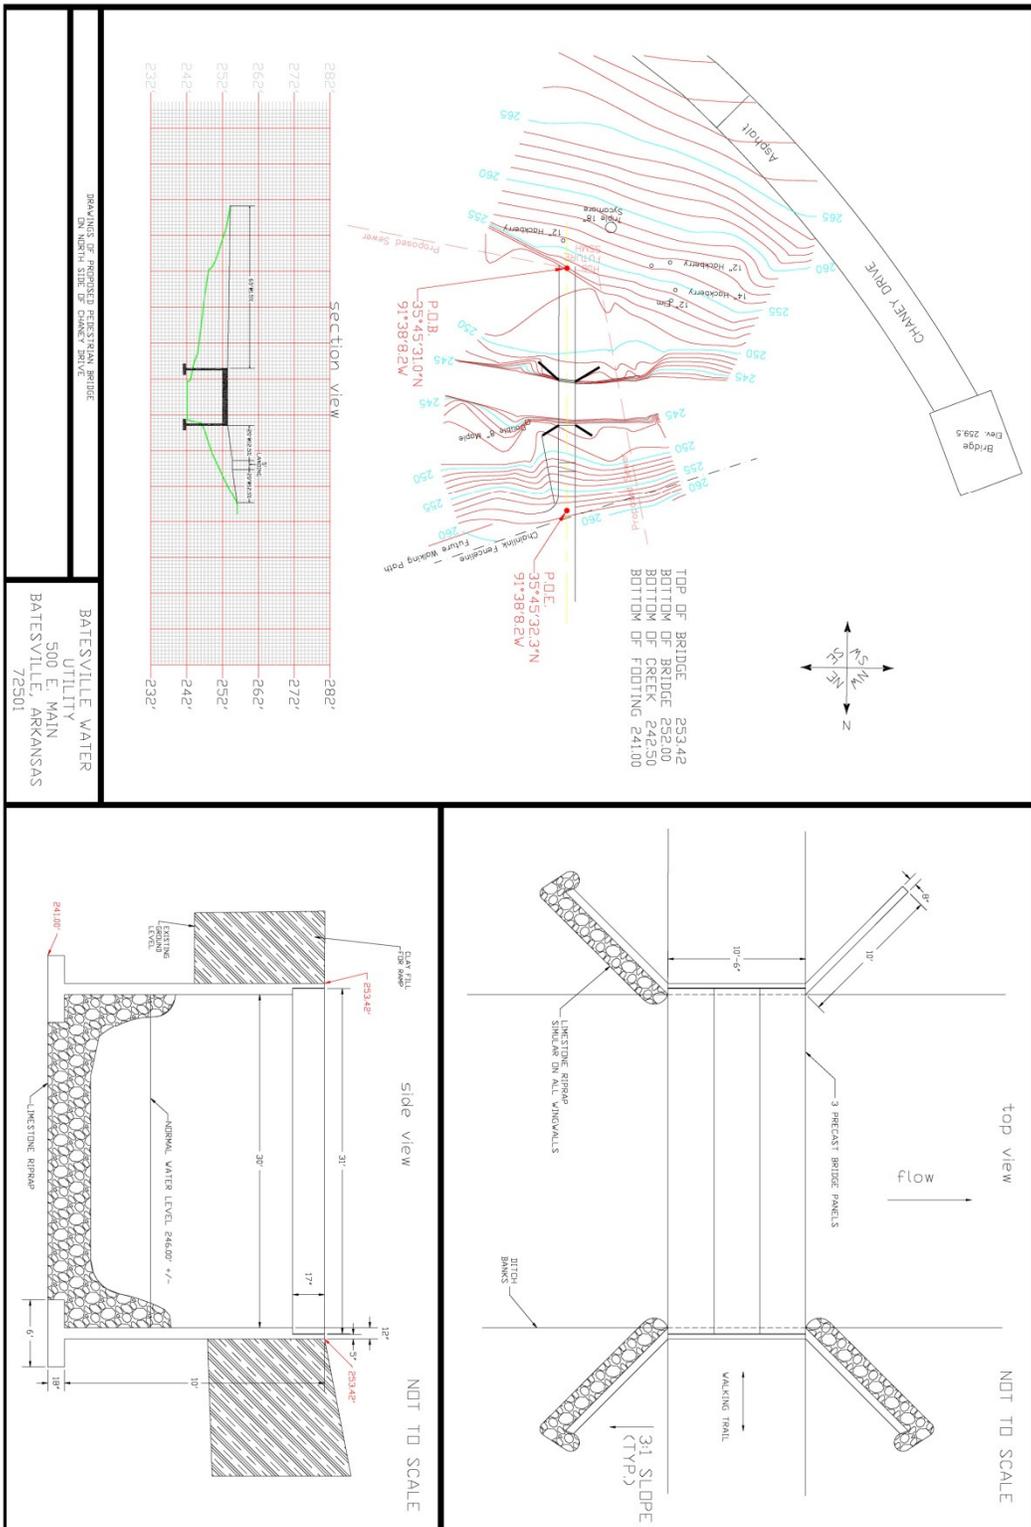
Proposed Pedestrian Bridge Plan View and Cross-Section
